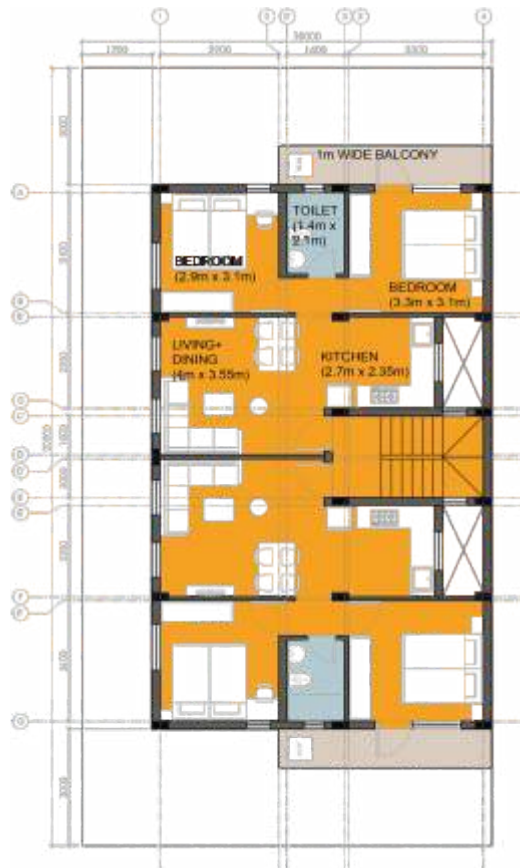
Typical ground floor plan of Type 6 dwelling unit
